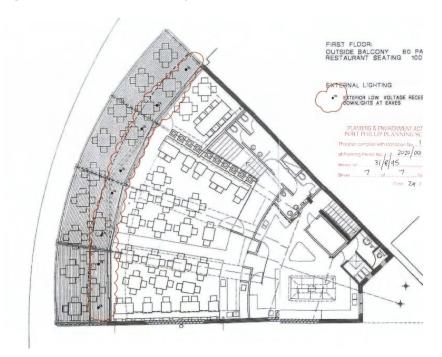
1st Floor indicative plan (Source: NFA Architecture)
